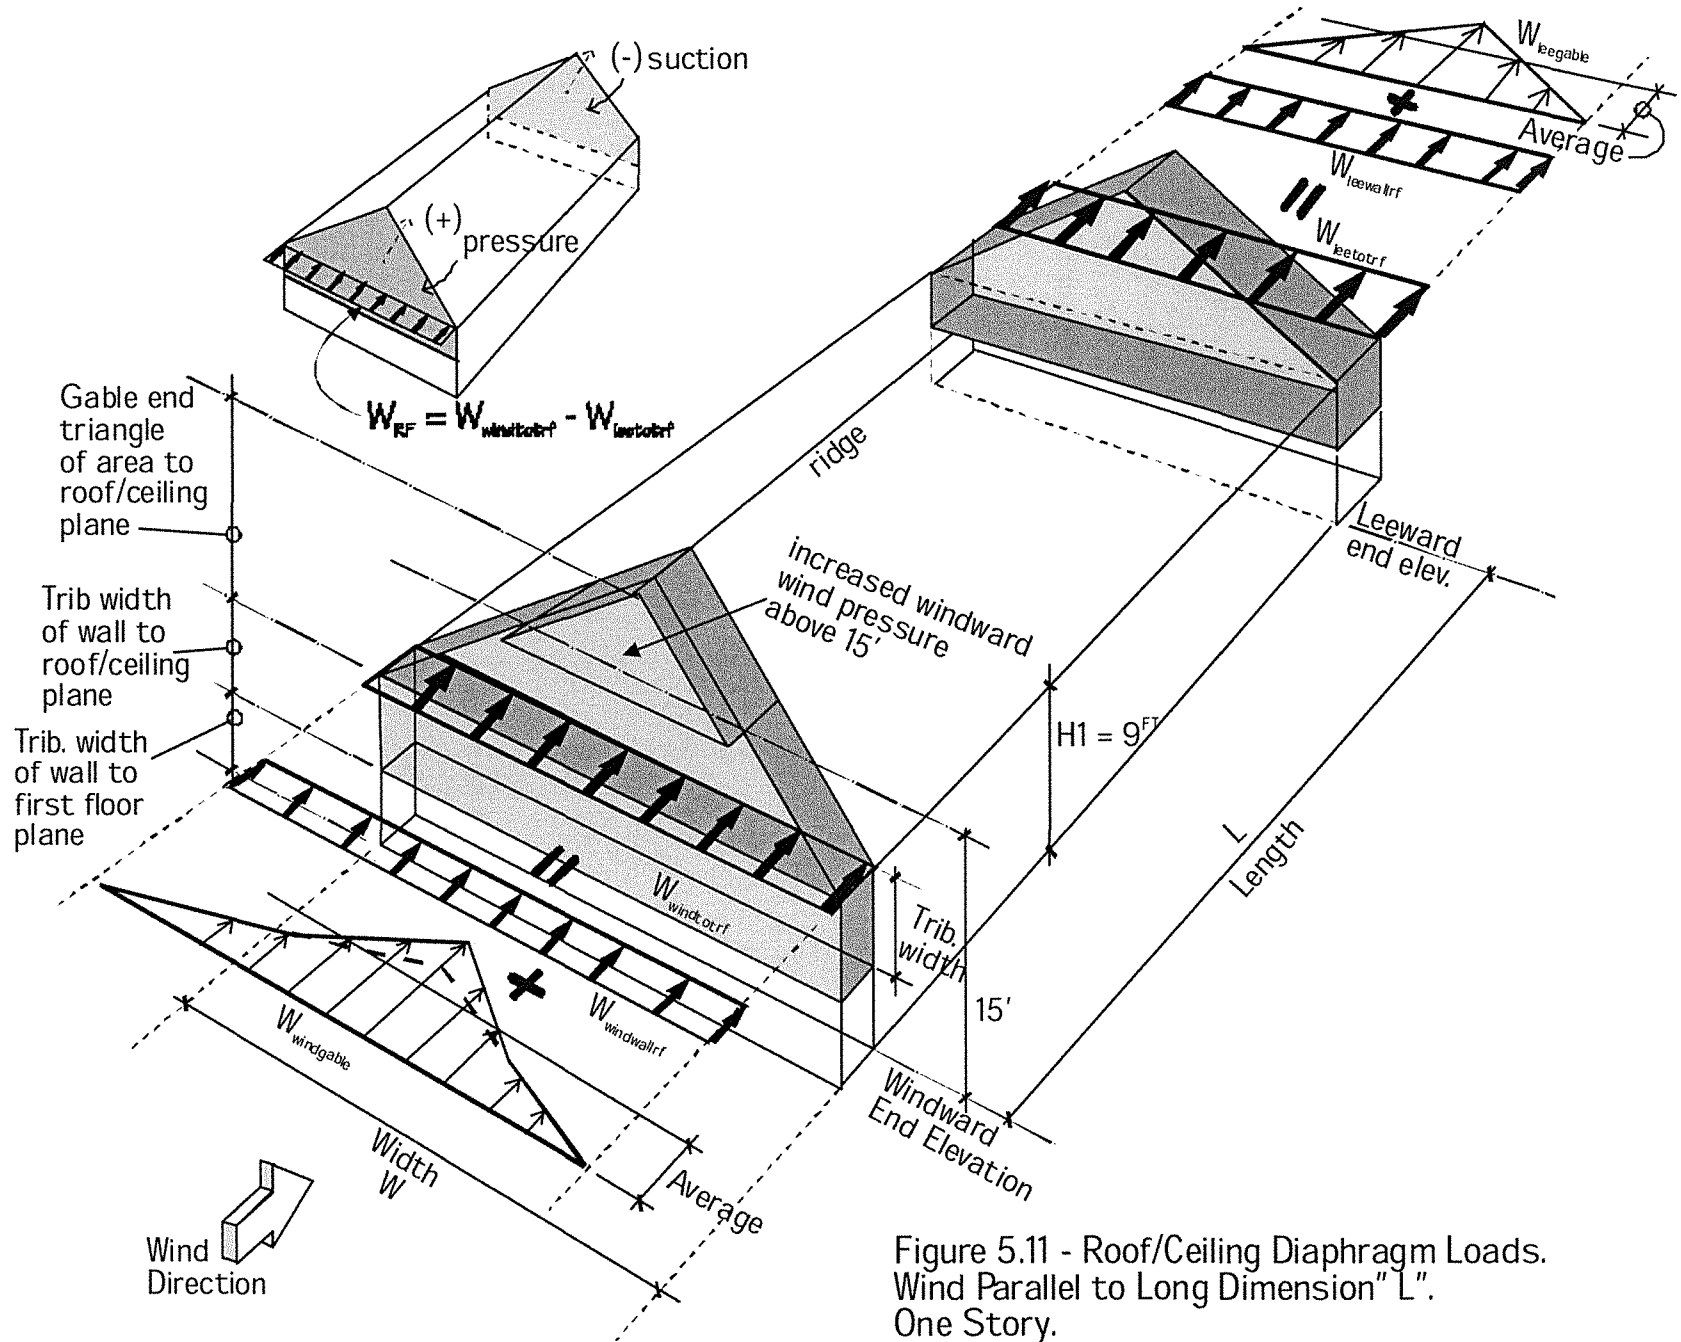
Roof/Ceiling Diaphragm Loads. Wind Parallel to Long Dimension "L". One Story.
